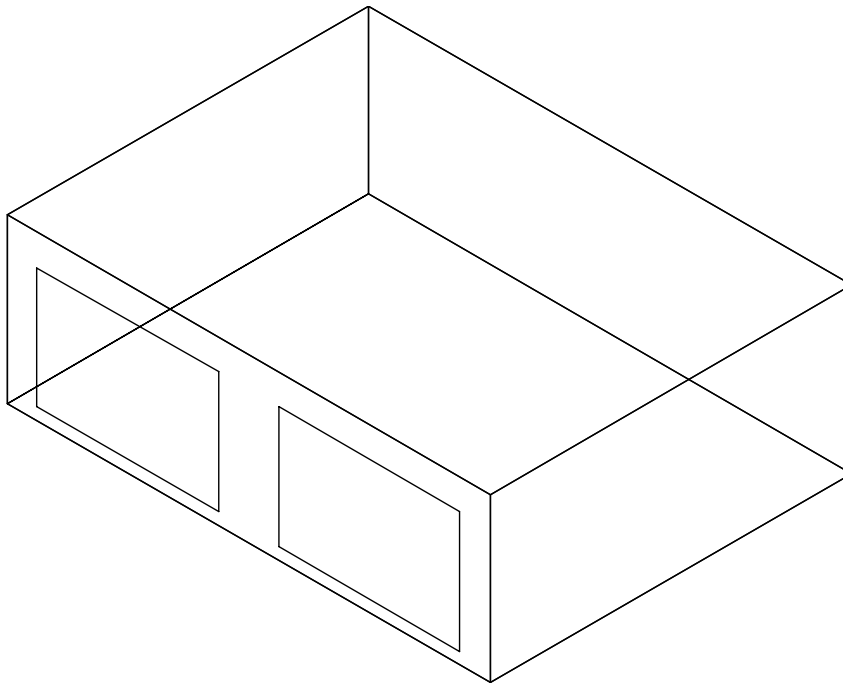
Base Building (Case 600) - Isometric View of Southeast Corner with Windows on South Wall
